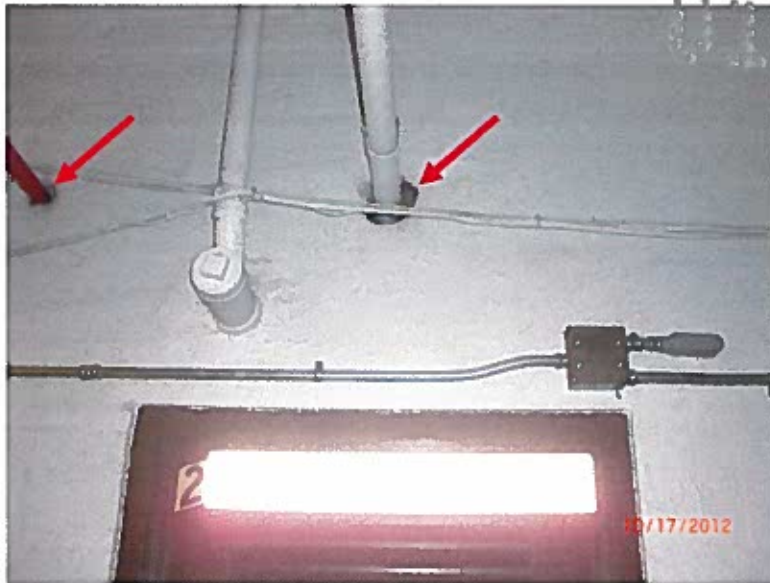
trench drain drop ceiling between Parking Spaces 52 & 61
